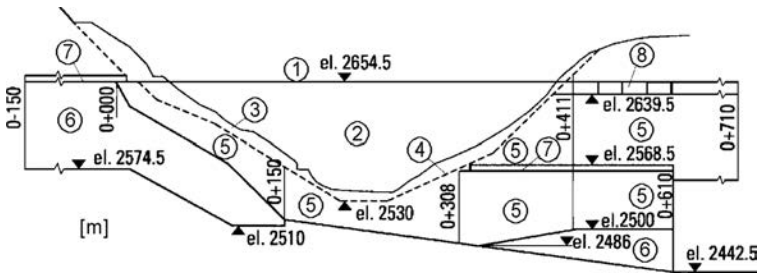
Water barriers in the Yele dam foundation (after Wang and Höeg, 2010) (1) Dam crest; (2) asphalt core; (3) ground surface; (4) excavation line; (5) concrete cutoff wall; (6) grout curtain; (7) construction gallery used for construction of grout curtain and concrete cut-off wall; (8) concrete core wall.
